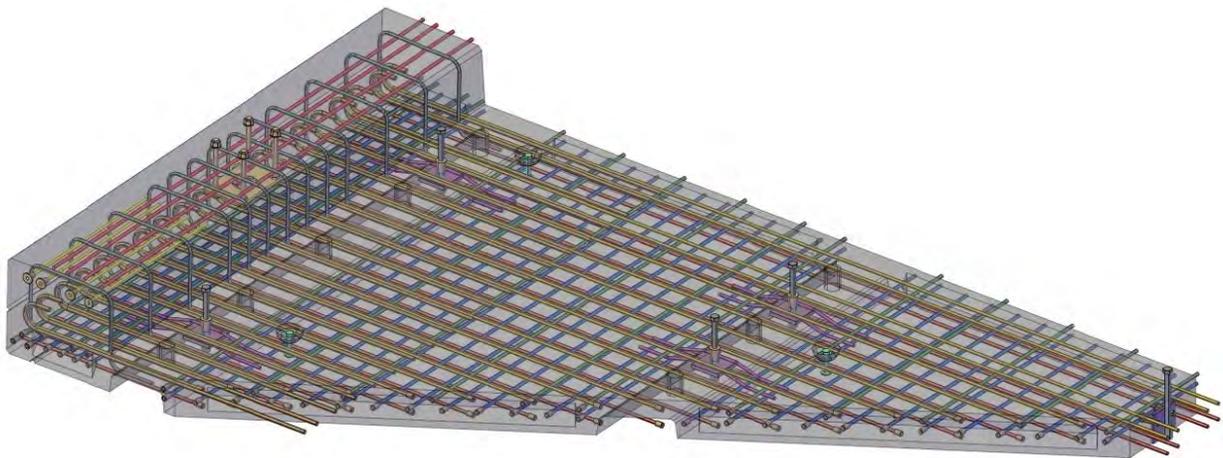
Conceptual view of precast deck panel (Superior Concrete, LLC, Auburn, ME)
